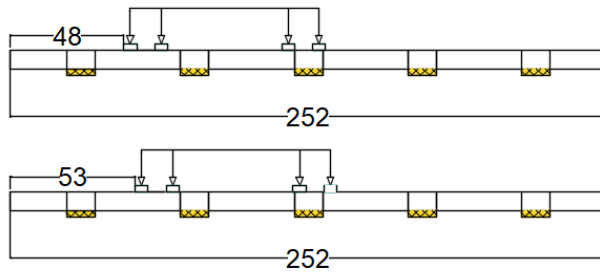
Location of P-15 truck for 4 ft girder spacing deck slab (Case 1, unit: in)
